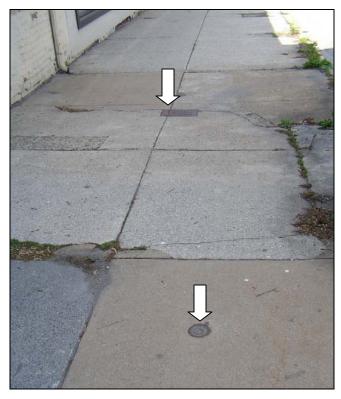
Photo C: Caps in sidewalk for abandoned heating oil UST (146-150 North Beaver Street)
